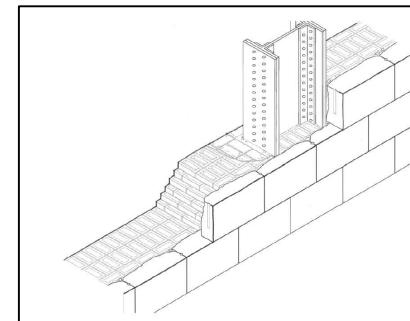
DRAWING SHOWING INDICATIVE FACADE CROSS-SECTION WITH EMBEDDED STANCHION ENCASED BY MASONRY UNITS (INGRAM CONSULTANCY FACADE CONDITION REPORT, 2022).
